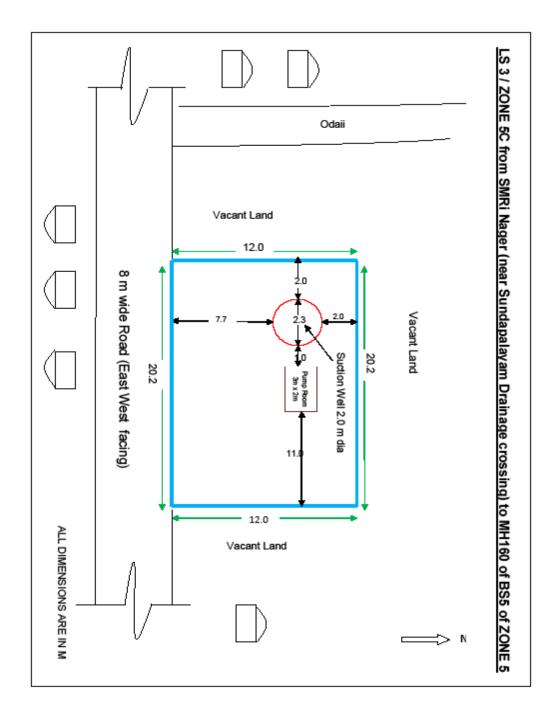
Site Set out Plans – Zone V (Near Sundaram palayam drainage crossing)
